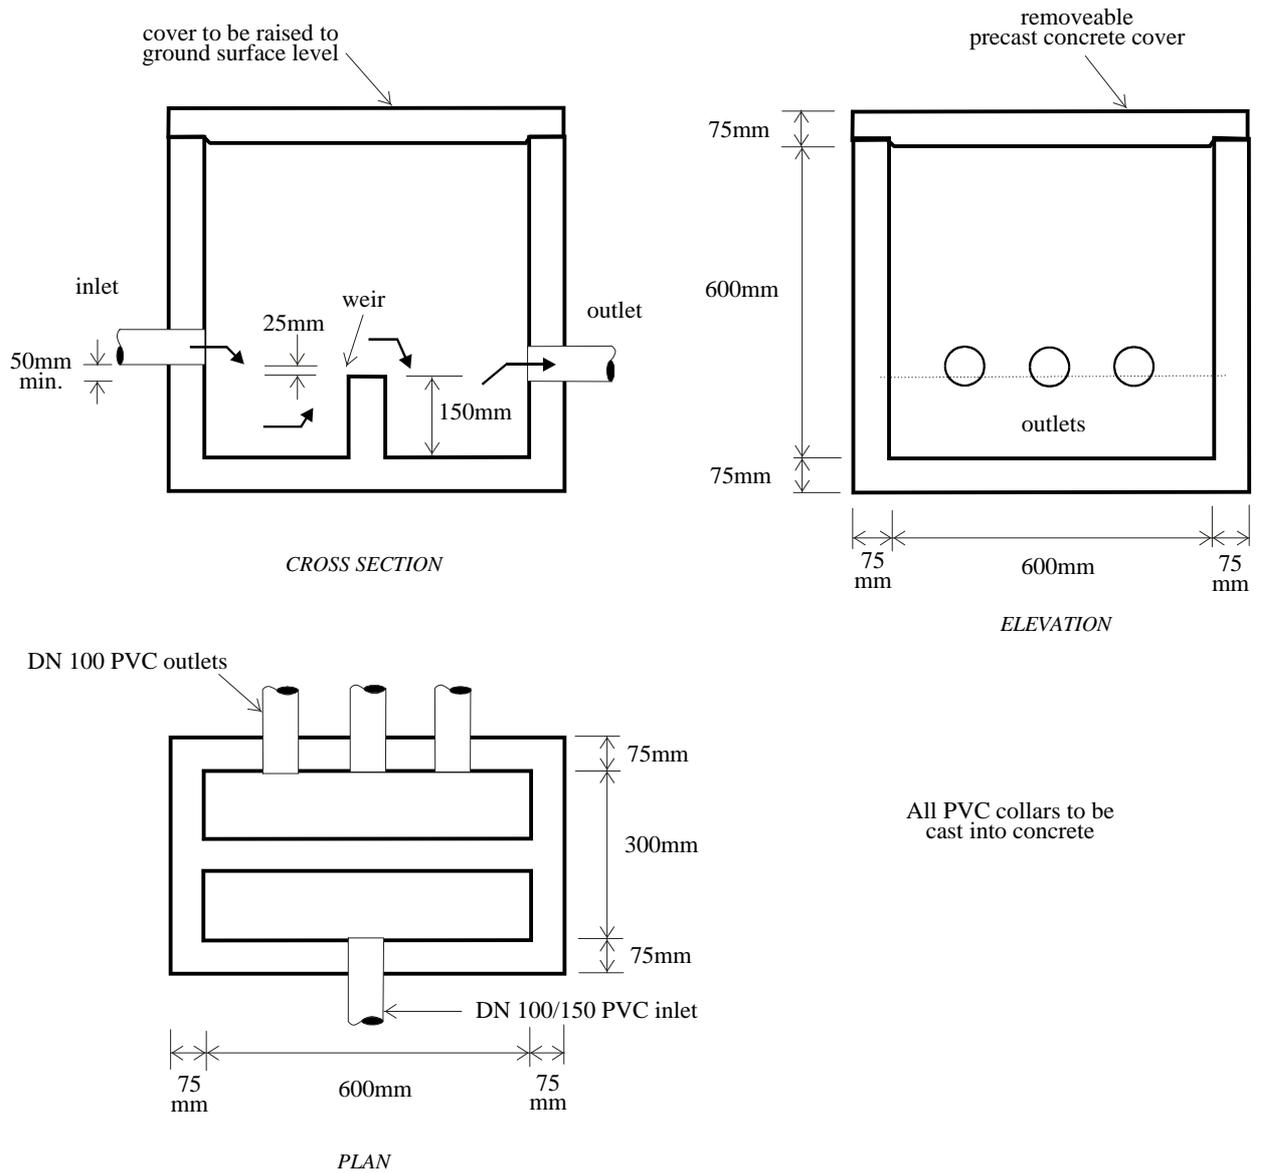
TYPICAL DISTRIBUTION SUMP
